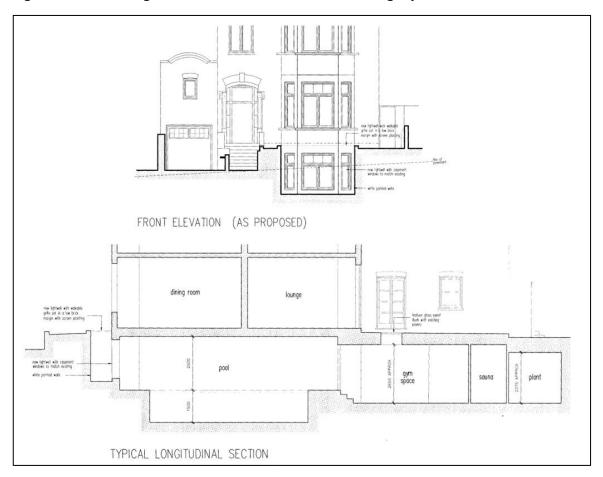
Planning Details for Basement at No 34 Willoughby Road
